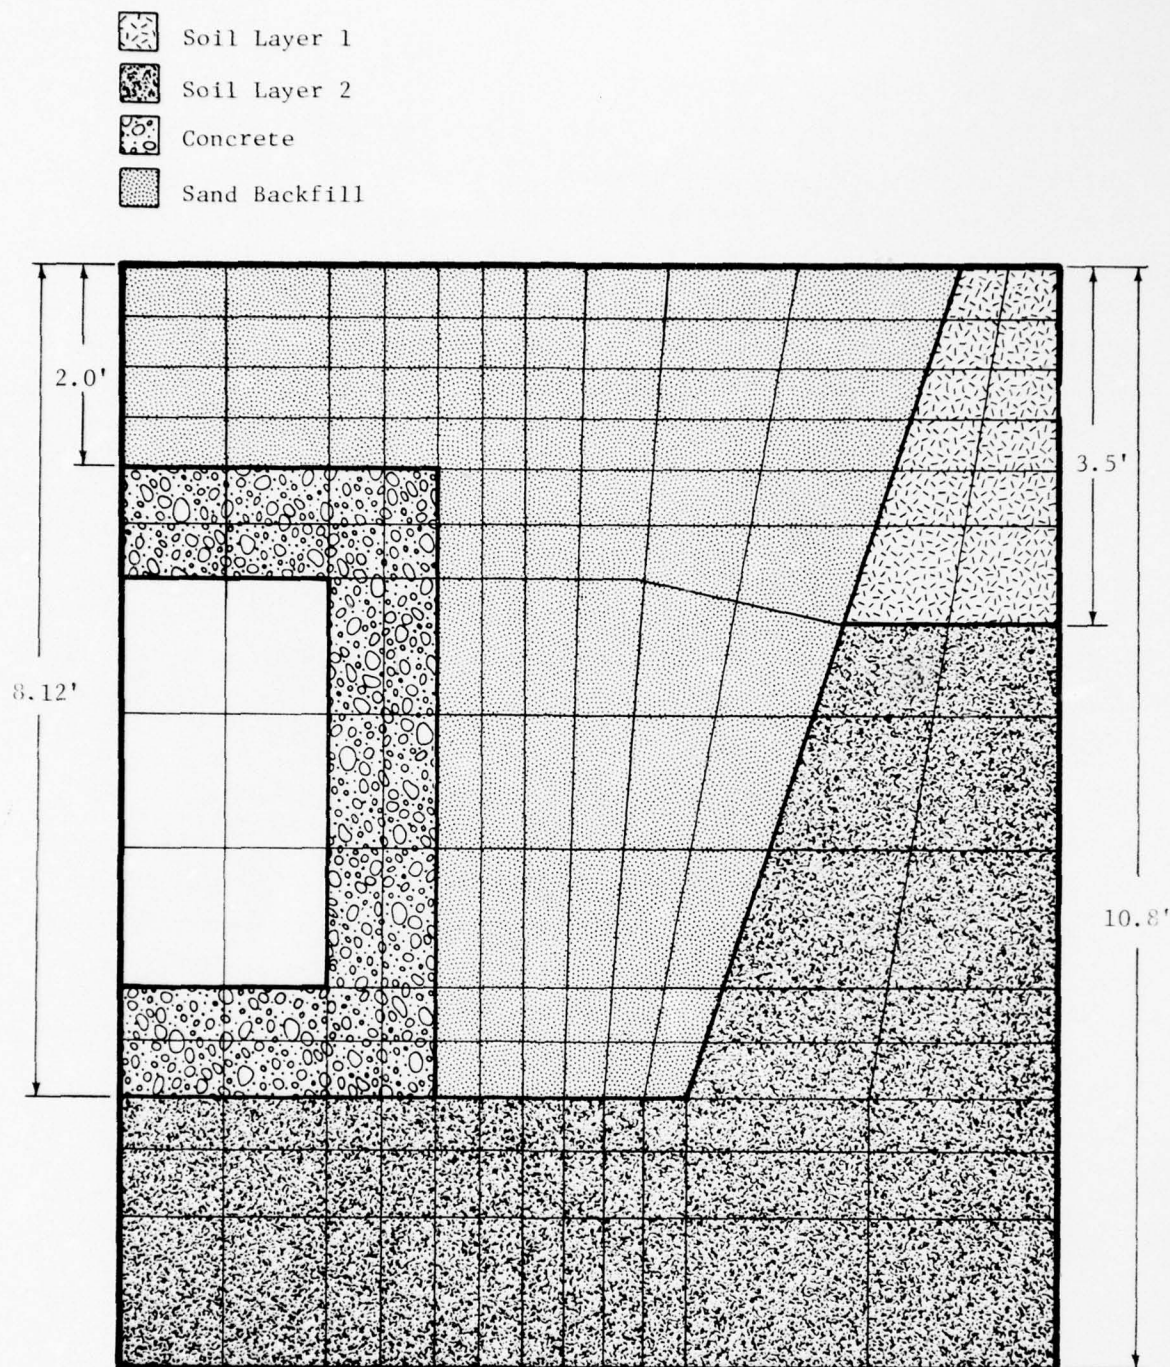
Elevation View of Transverse Section Through Finite Element Model of Rectangular Structure 3D.
